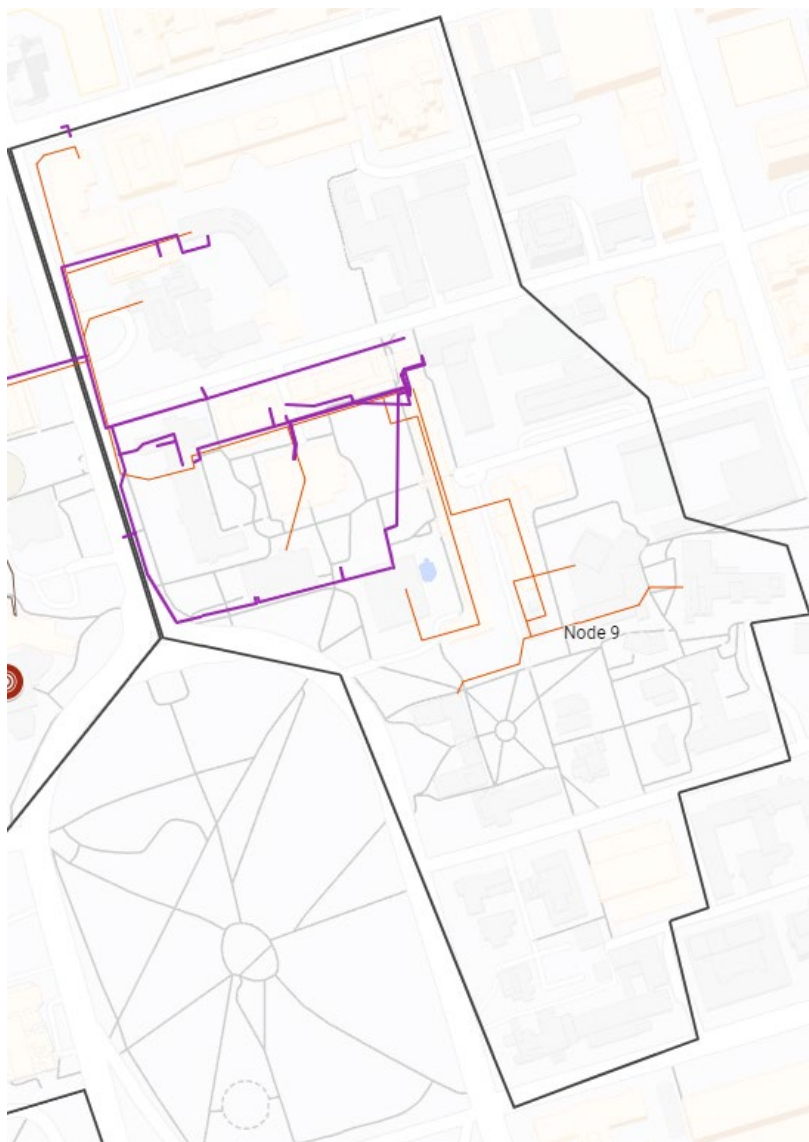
Existing Steam(red) and electrical (purple) distribution feeding buildings east of Queen's Park
